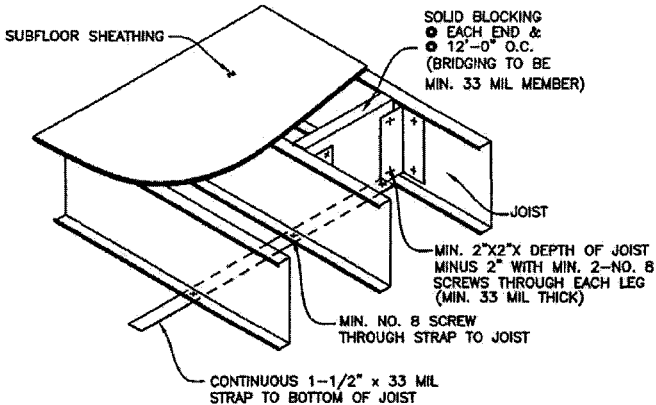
Floor Joist Bracing (NASFA 2000)
